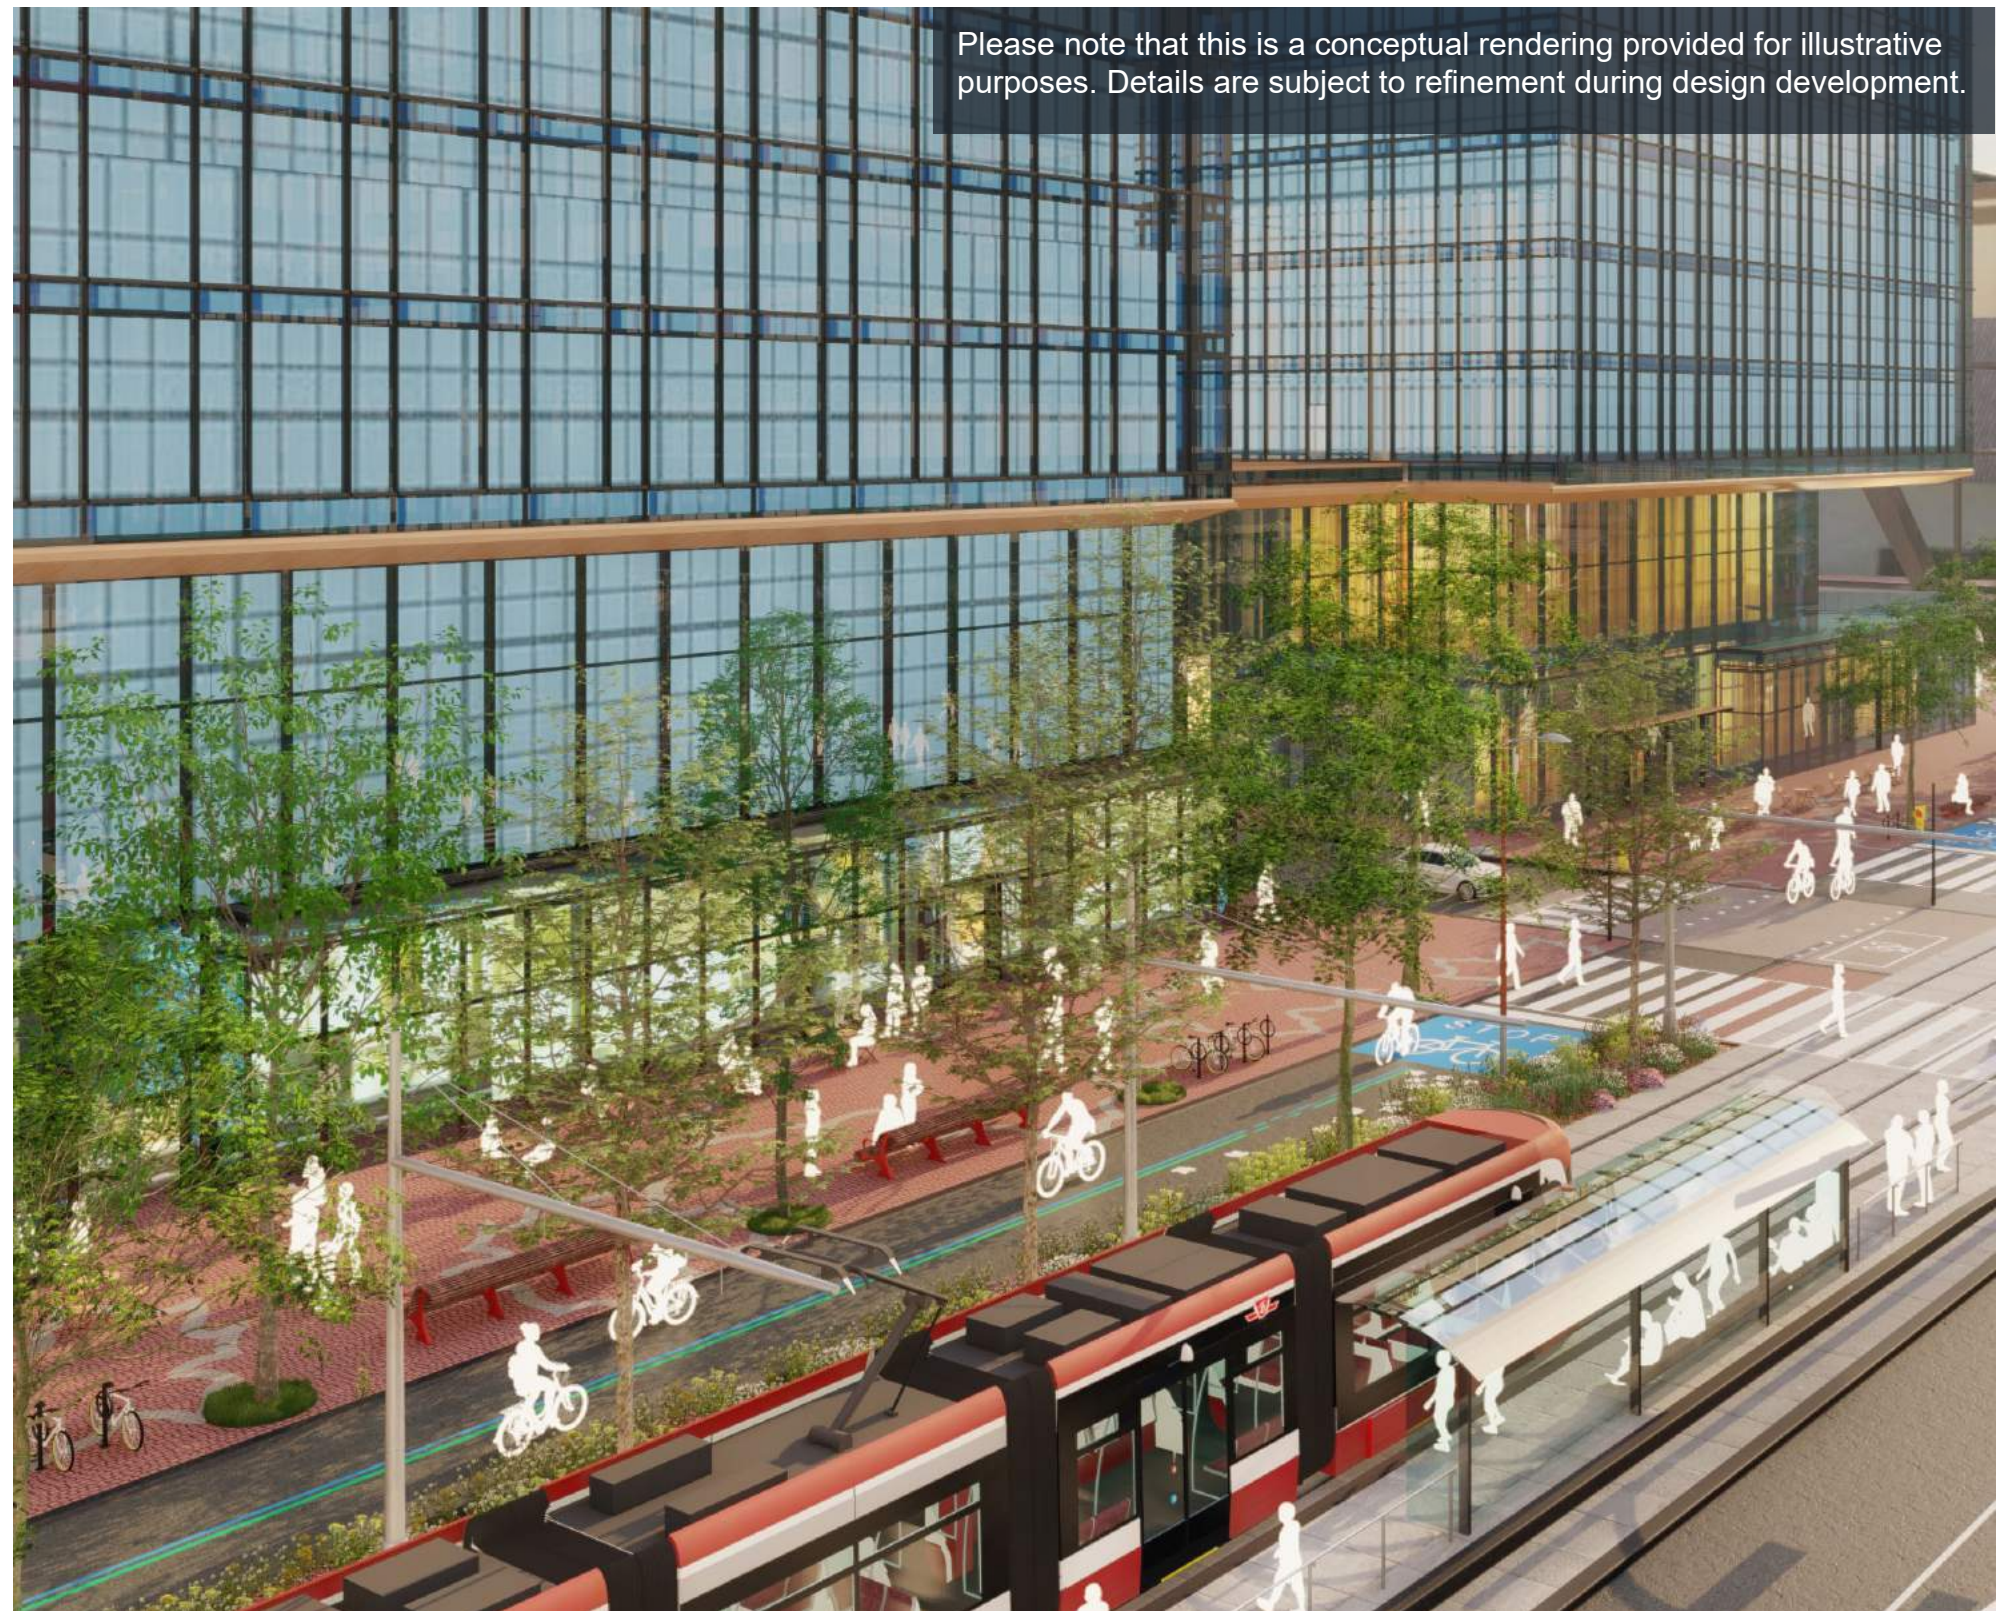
Rendering of an at-grade streetcar stop © West 8 + DTAH
